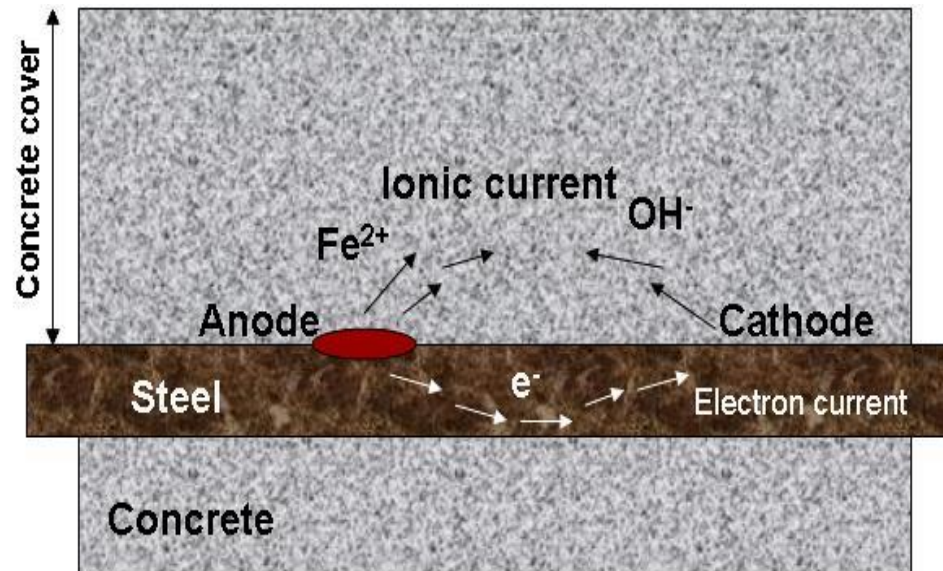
Corrosion of reinforcing steel (The Concrete Portal, 2021)
